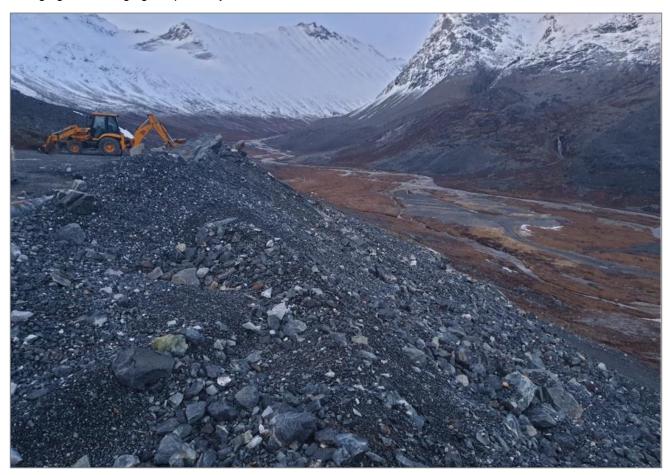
Waste rock dump exterior to the 300 Level portal, looking up the valley to the northeast (Golder, 2020a)
